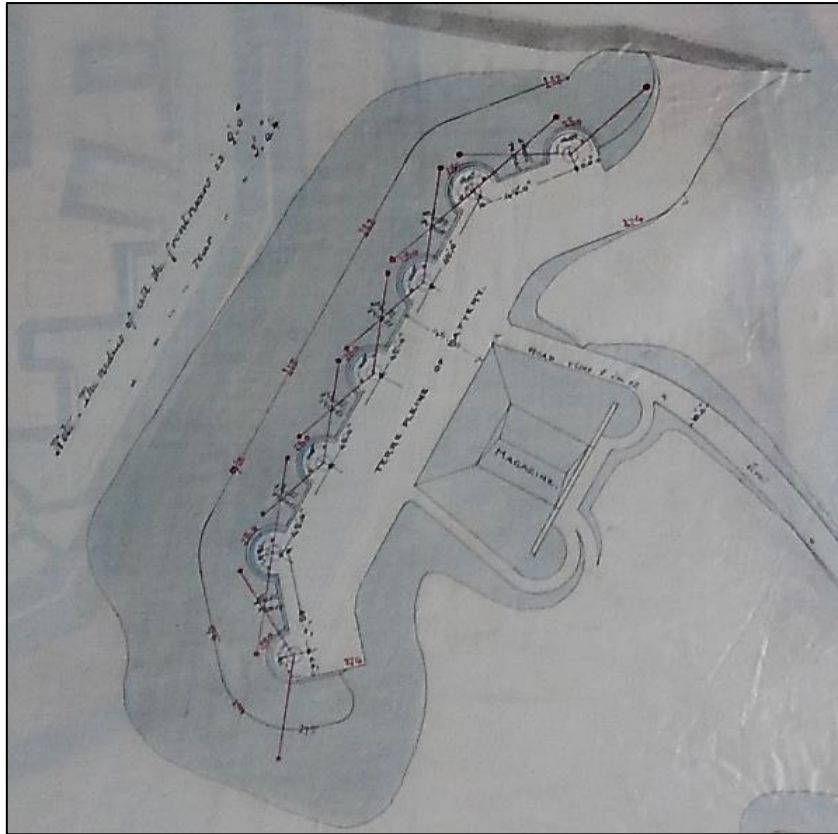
1864 plan- original constructions plans of Hatherwood Battery, National Archived WO 78/2663/4.
